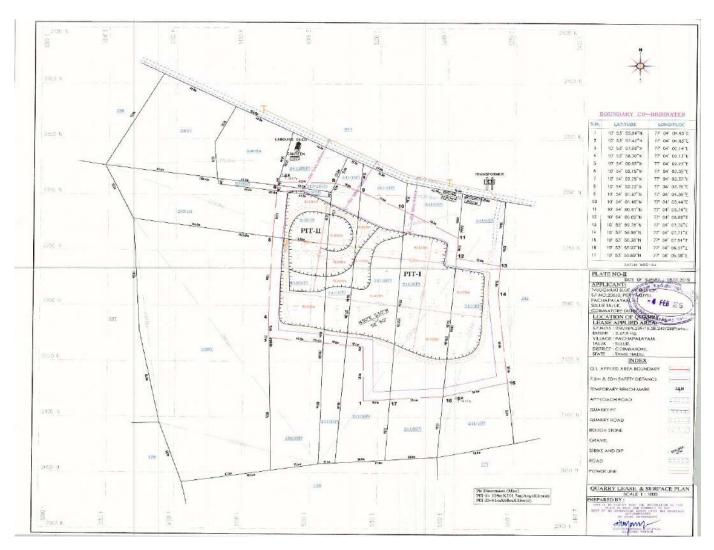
QUARRY LEASE PLAN / SURFACE PLAN – P1
